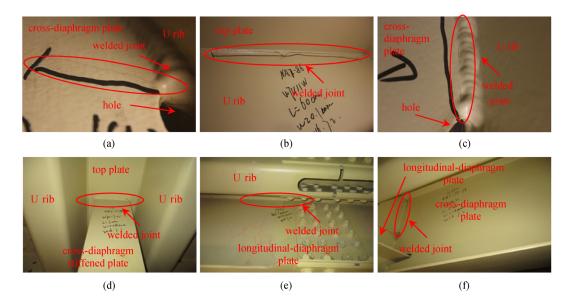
Cracks in steel box girder of long-span bridge: (a) crack at cross-diaphragm plate around the hole; (b) crack at welded joint between top plate and U rib; (c) crack at welded joint between cross-diaphragm plate and U rib; (d) crack at welded joint between cross-diaphragm stiffened plate and top plate; (e) crack at welded joint between top plate and longitudinal-diaphragm plate; (f) rack at welded joint between cross-diaphragm plate and longitudinal-diaphragm plate.
